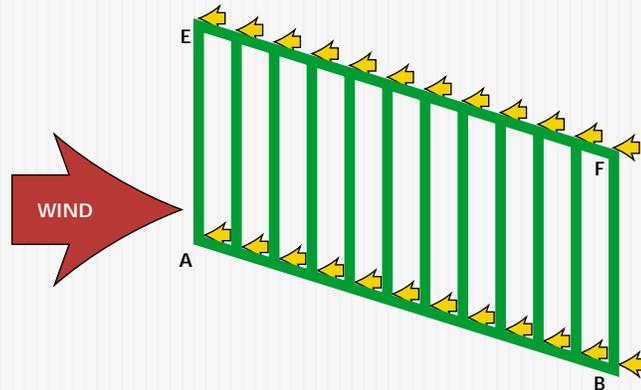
Perimeter anchor bolts – transfer forces into foundation
